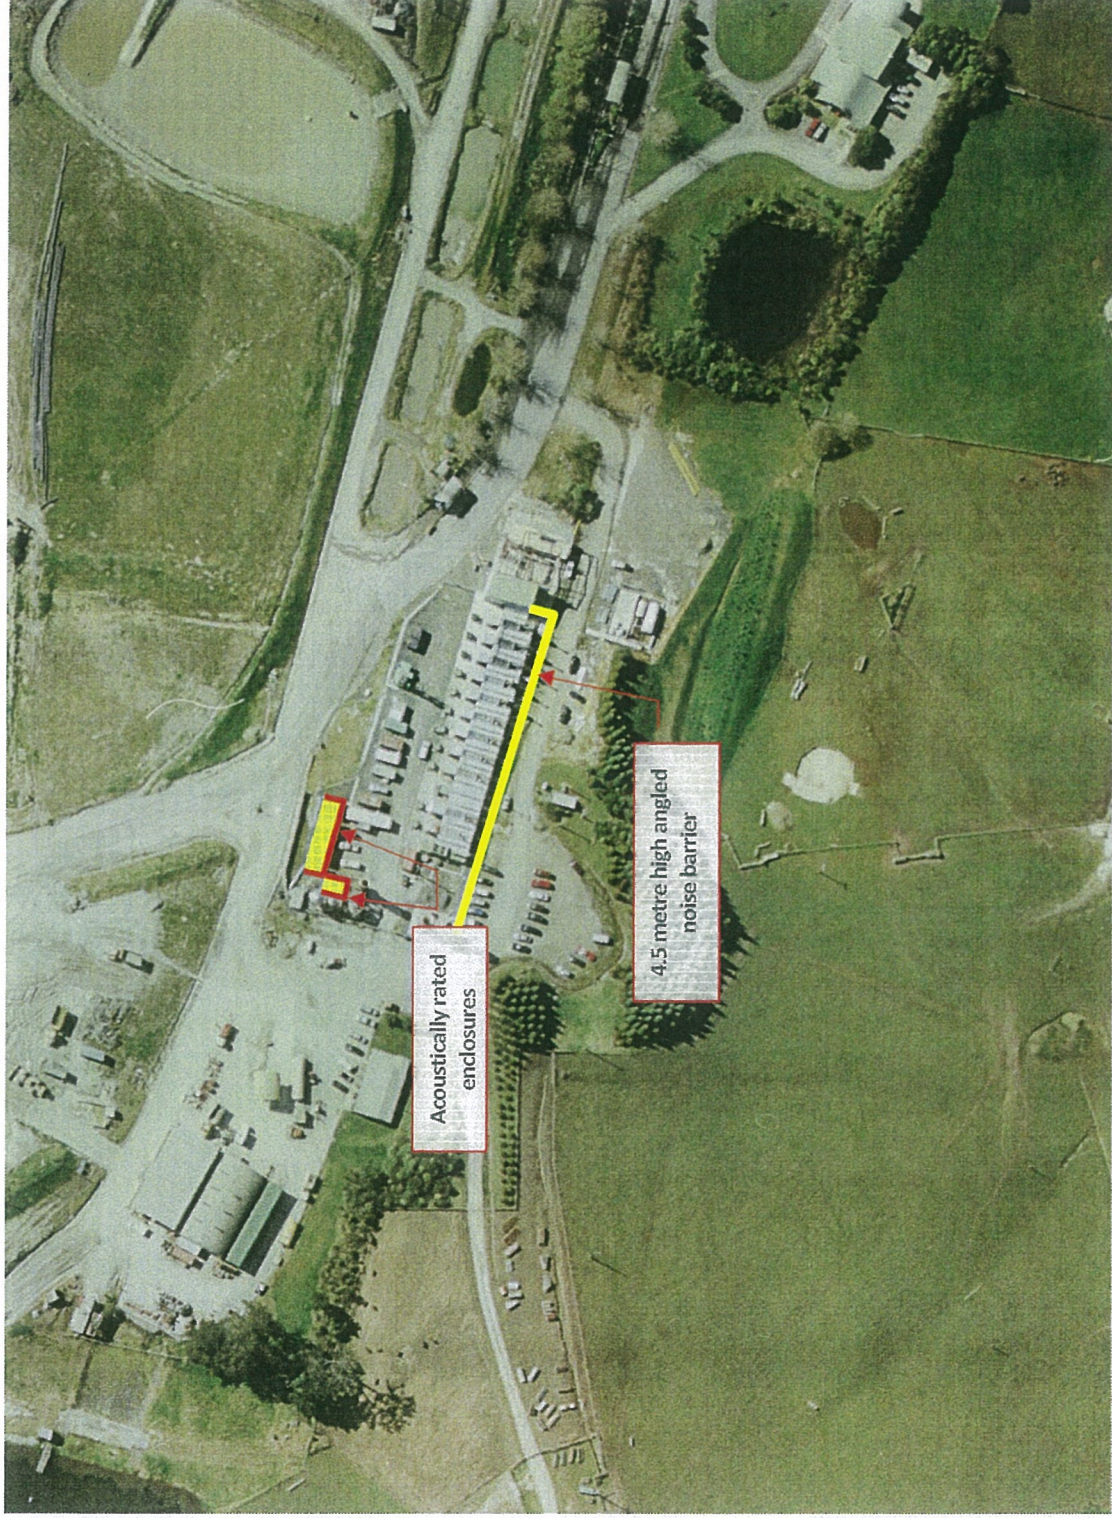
Plan view showing recommended noise barrier and acoustic enclosures
